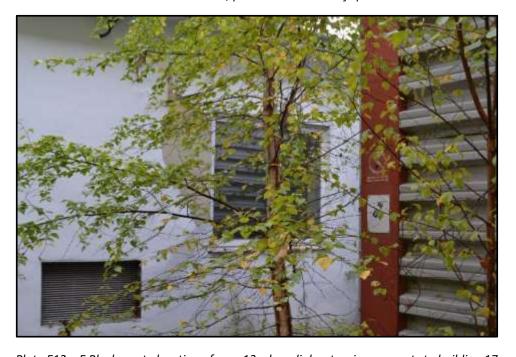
E Block, east elevation of spur 13 where link extension connects to building 17
